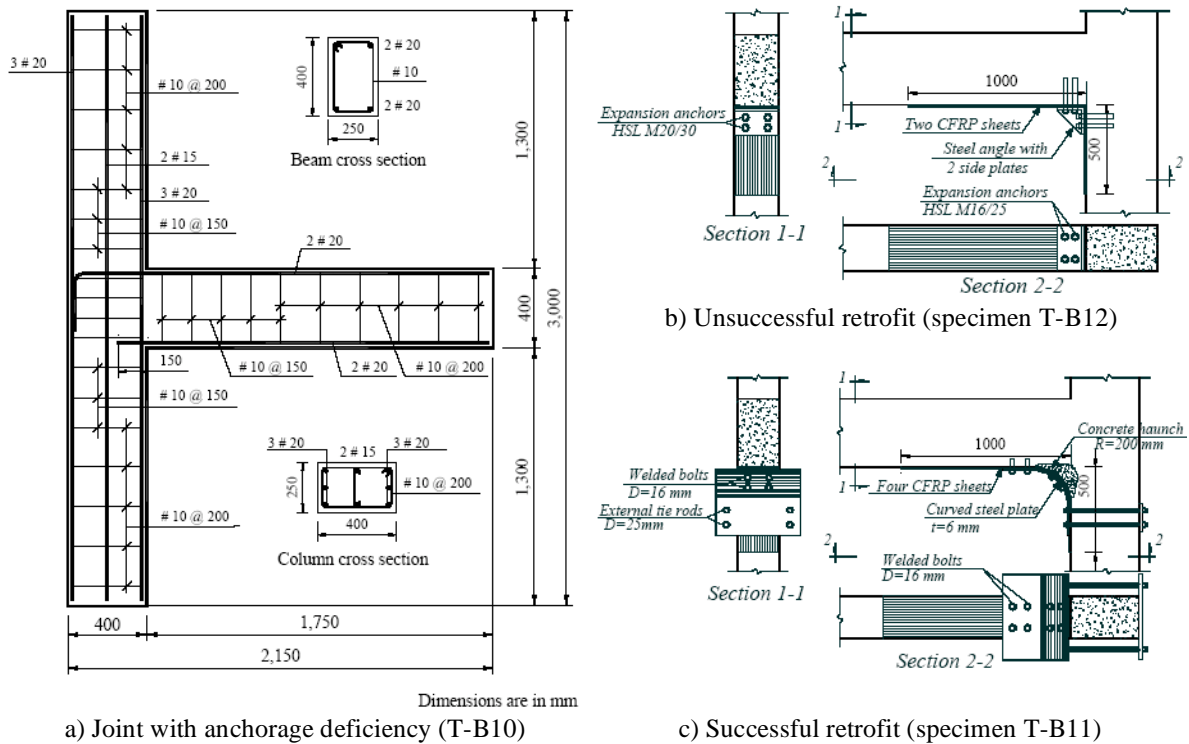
CFRP retrofitting of external beam-column joints with anchorage deficiency [El-Amoury, 2004]
